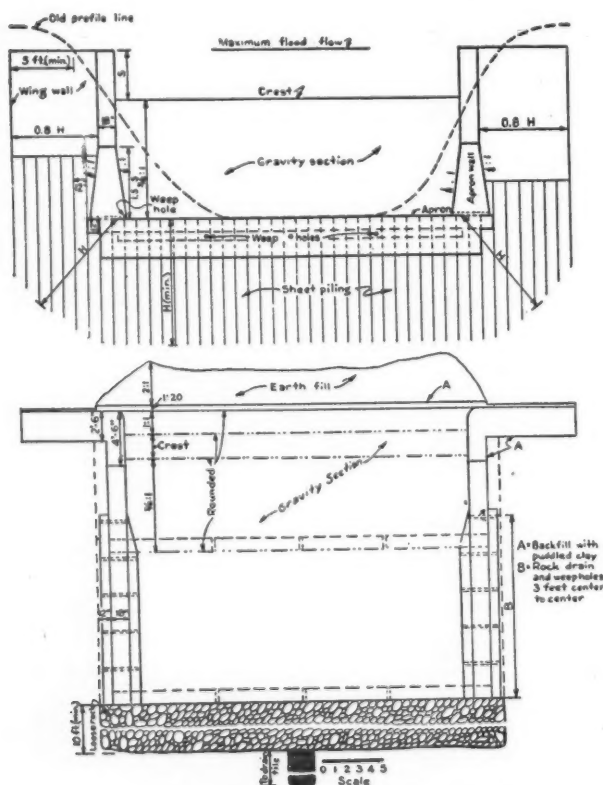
Plan and section of masonry overflow dam, Fig. 11.
